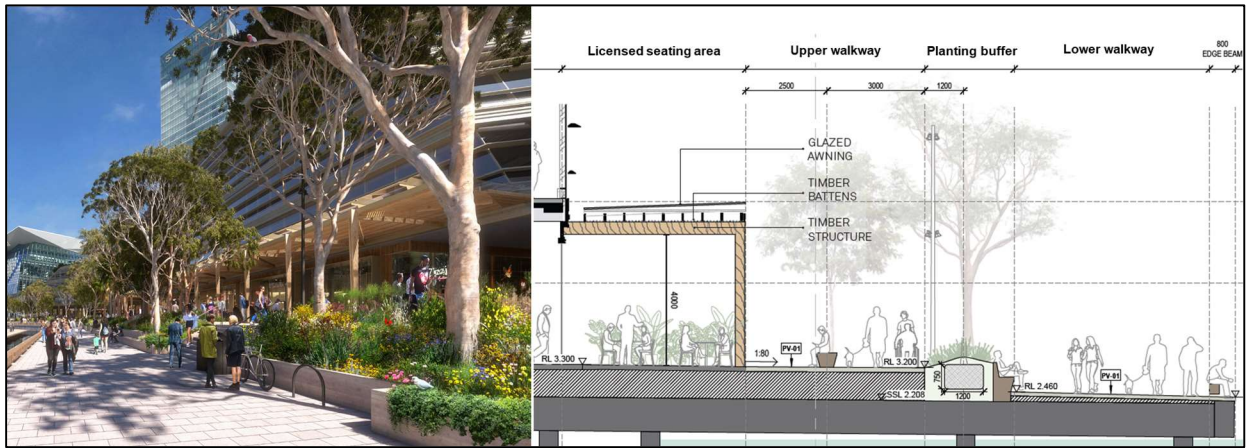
| Waterfront Promenade design and layout (Source: Applicant's Updated Design Report)
